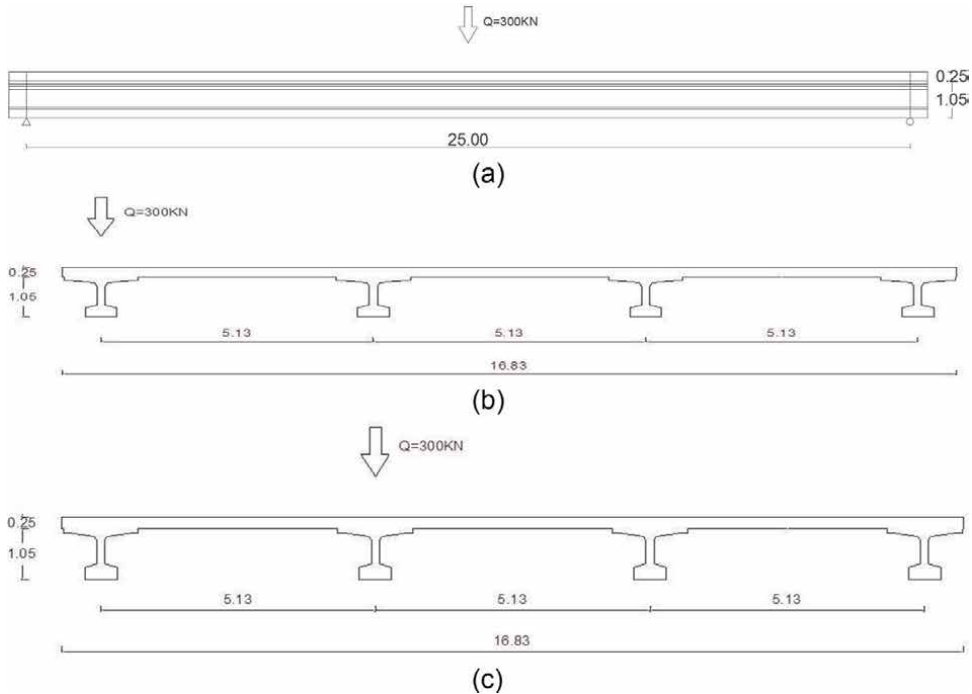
Girder bridge deck: (a) side view of load states 1 and 2; (b) front view of load state 1; (c) front view of load state 2.
